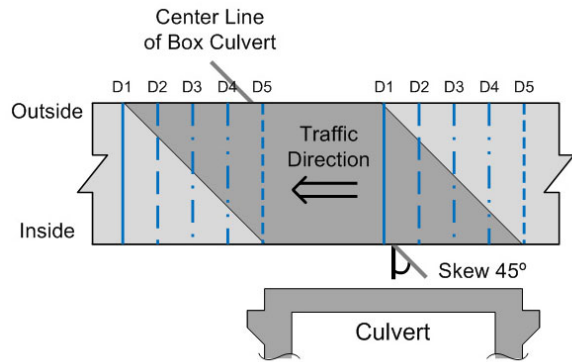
Joint Positions of Slab over 45° Skewed Box Culvert
